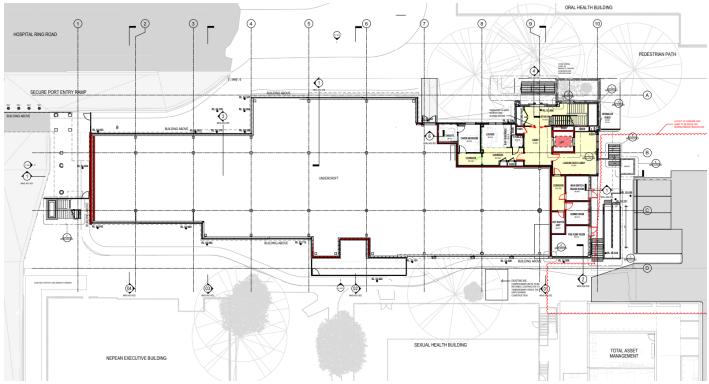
CAMHS ground level (Level 01) floor plan (STH)
